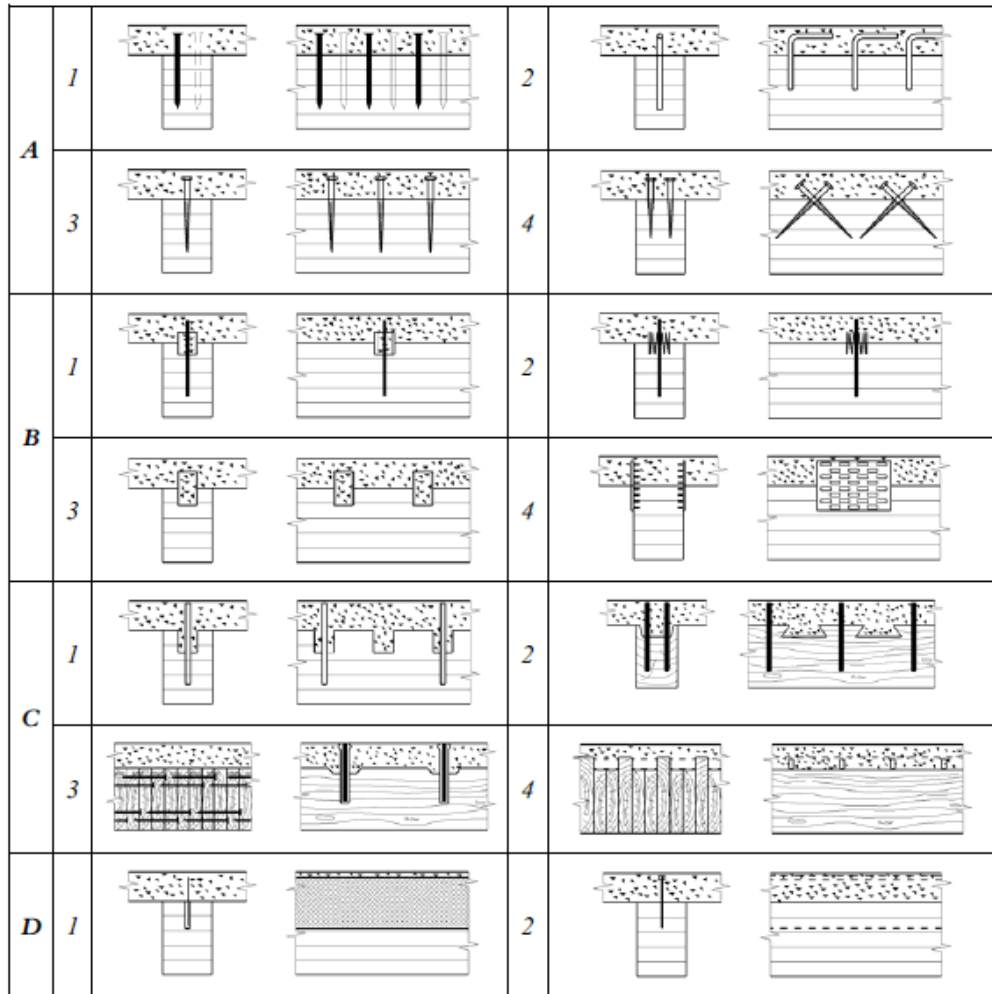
Examples of timber-concrete connections with: nails (A1); glued reinforced concrete steel bars (A2); screws (A3); inclined screws (A4); split rings (B1); toothed plates (B2); steel tubes (B3); steel punched metal plates (B4); round indentations in timber, with fastener preventing uplift (C1); square indentations, (C2); cup indentations and pre-stresses steel bars (C3), nailed timber planks deck and steel shear plates slotted through the deeper planks (C4), steel lattice glued to timber (D1); and steel plat glued to timber (D2) (Ceccotti 1995)
